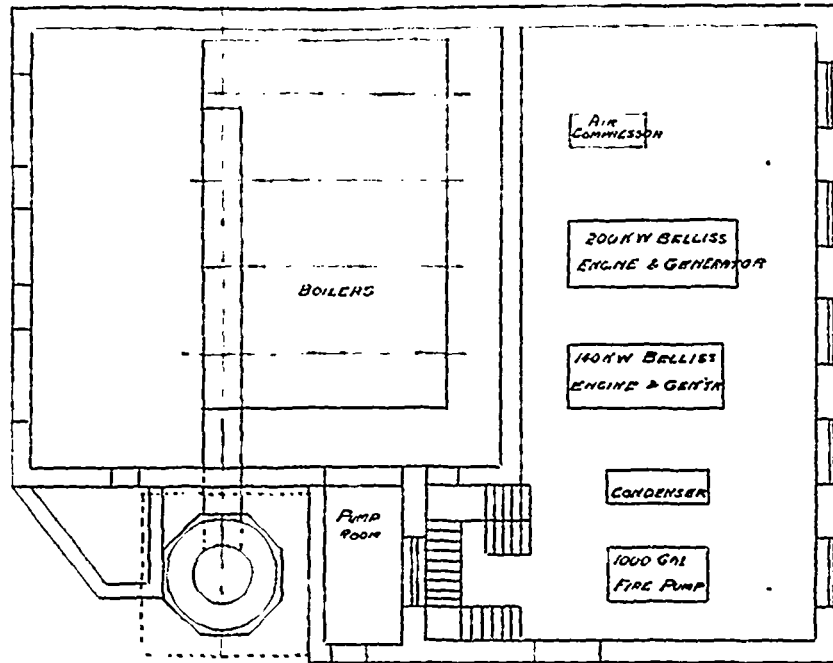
POWER PLANT, FROST & WOOD CO., SHOWING LAYOUT OF PLANT.
